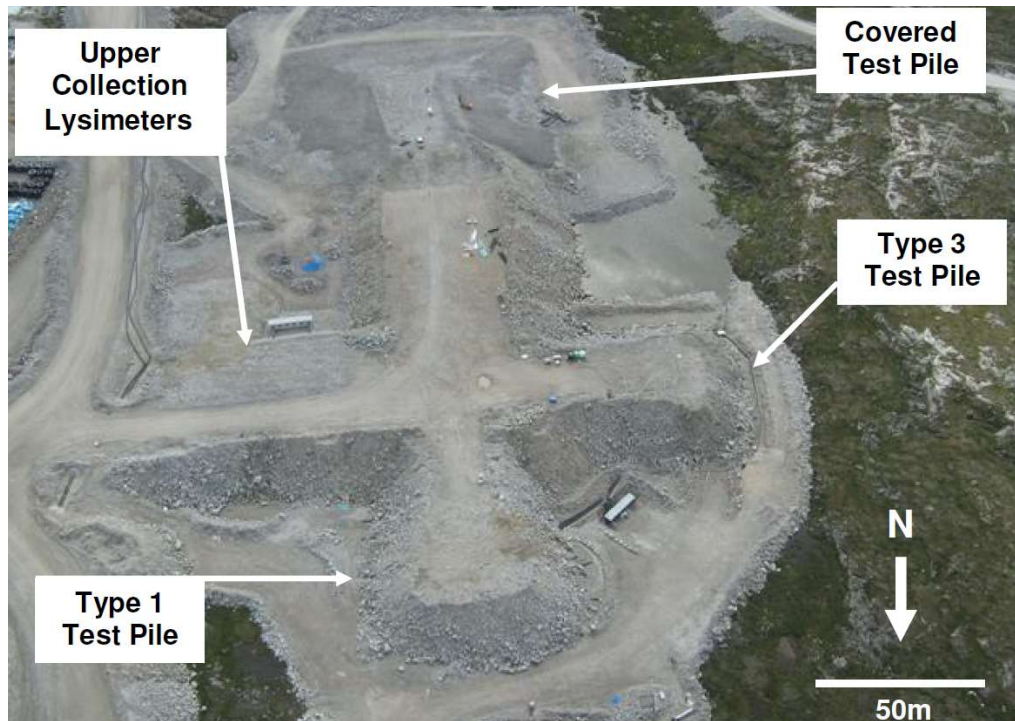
Aerial view of the Diavik test piles field site (Neuner, 2009).
